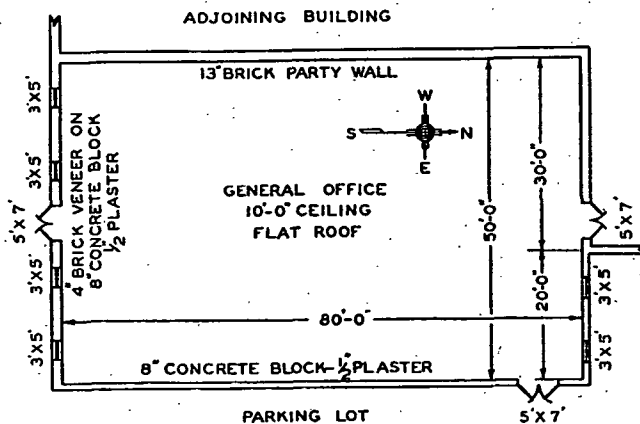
PLAN OF ONE-STORY OFFICE BUILDING
